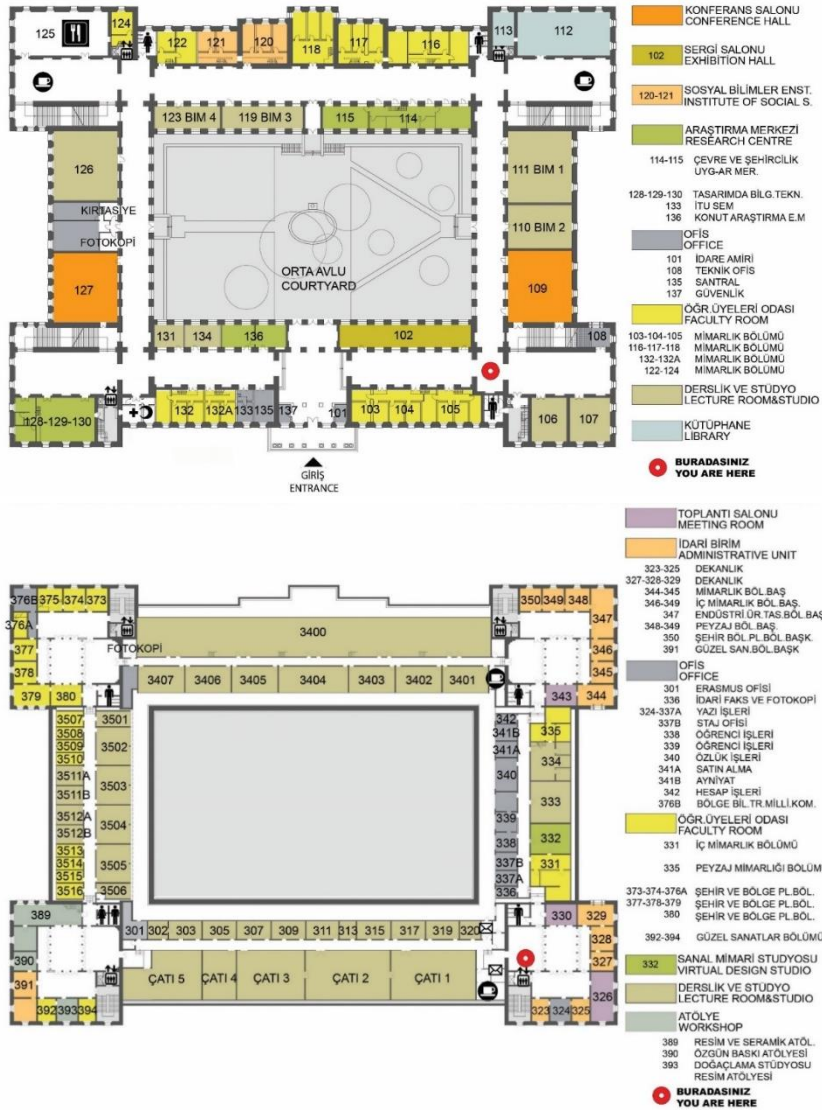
Top: Ground Floor Plan; Bottom: Second Floor Plan (ITU Faculty of Architecture, 2014).
